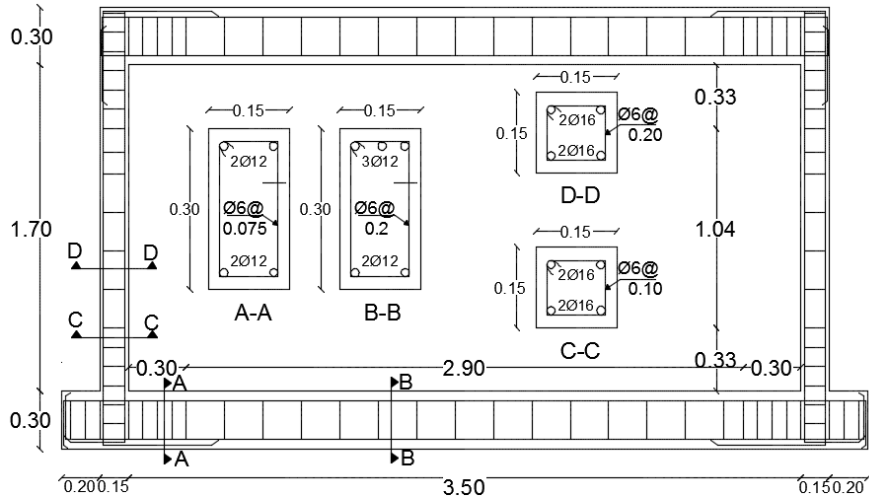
Geometry and reinforcement scheme of the rc frame (dimensions in m) [3]
